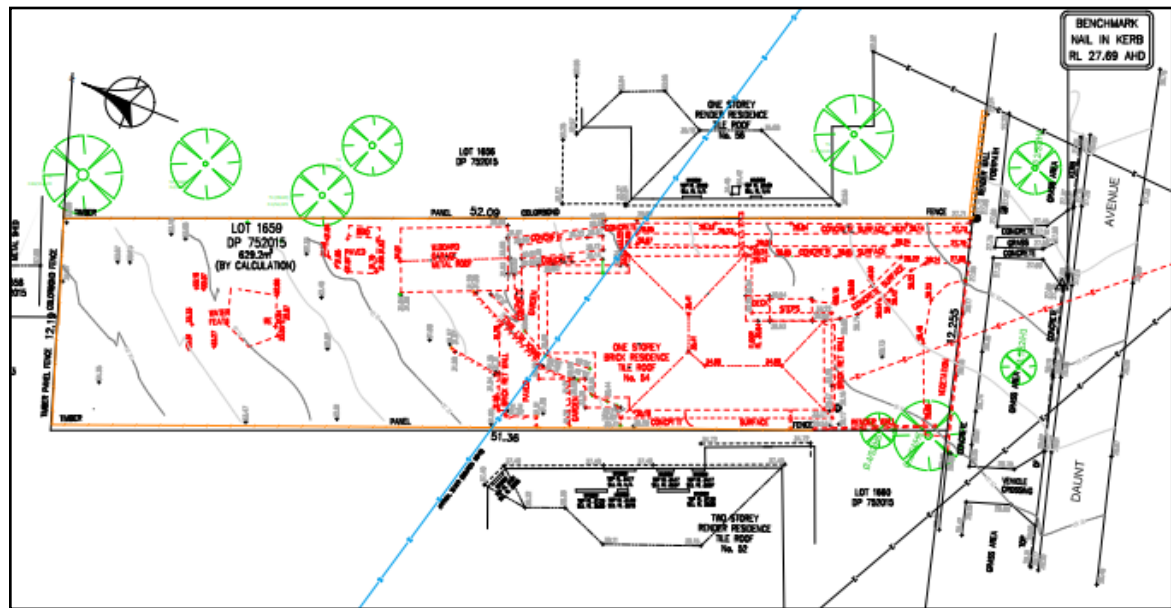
Demolition Plan - 54 Daunt Avenue (Source: Prime Design Studios)
